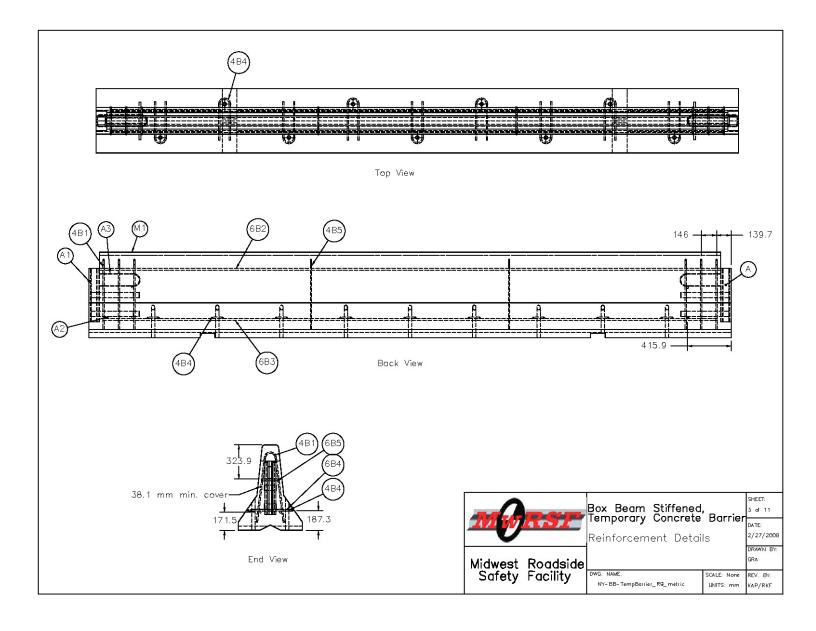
Temporary Concrete Barrier Reinforcement Details, Test NYTCB-1
